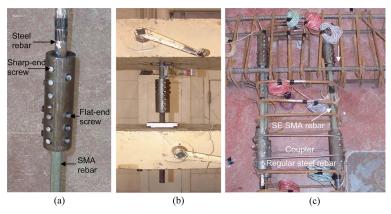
(a) Coupler used in BCJ specimens, (b) test setup of coupler in universal testing machine and (c) reinforcement caging of BCJs
